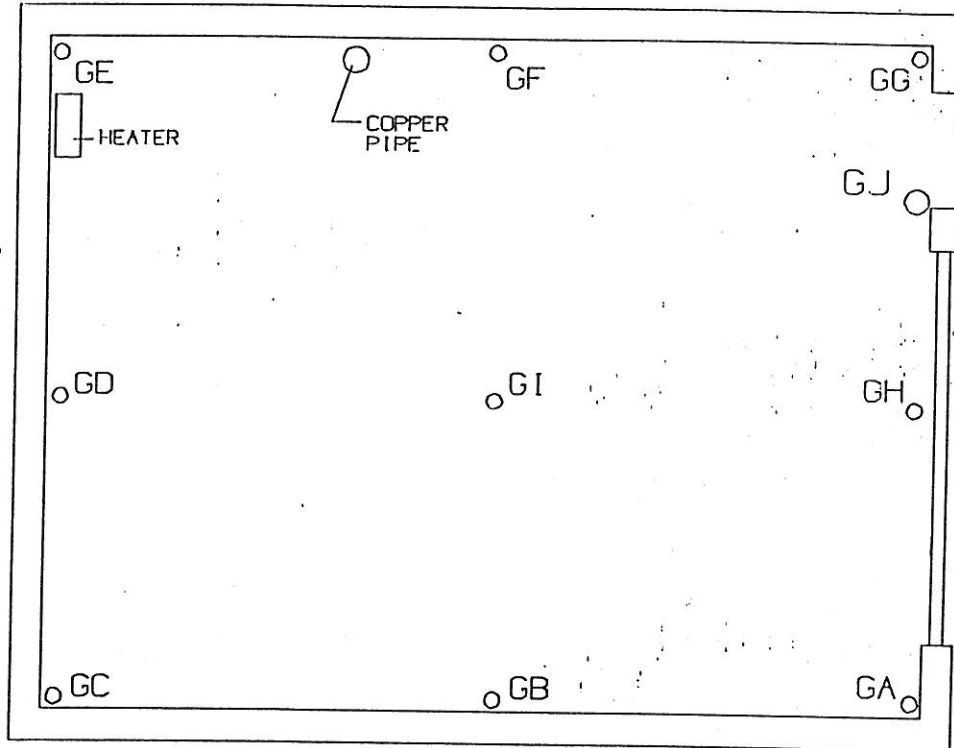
FLOOR PLAN OF HOUSE ON JONES RD.
